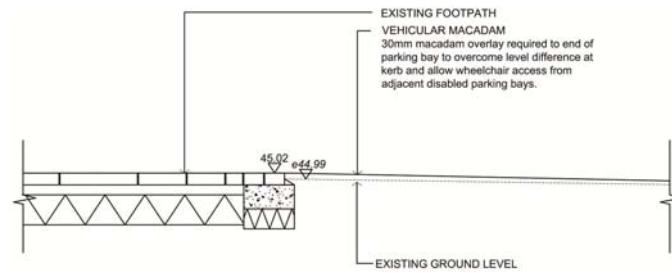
Detail through disabled parking access within RPA to Tree T6
